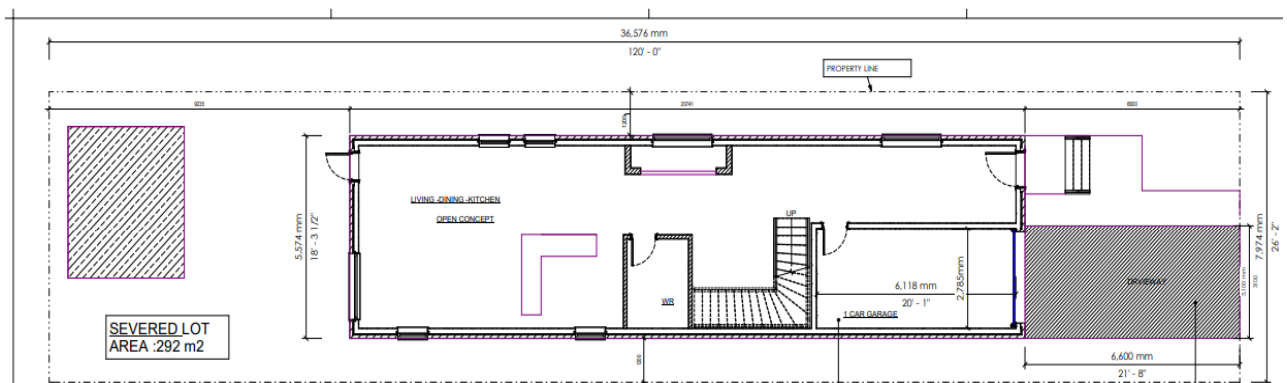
Floor Plan for the Proposed Detached Dwelling.
